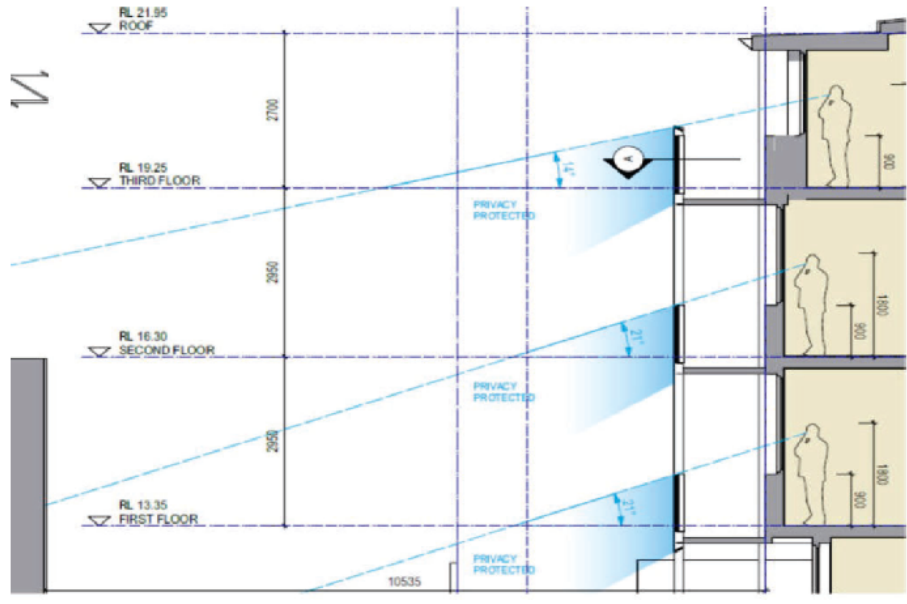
Windows on the southern side elevation are either elevated above floor level or are treated with a translucent film or as shown on the section diagram the use of (offset) privacy screens along the edge of the northern elevation demonstrate that overlooking is restricted from internal living areas toward No.12 and No.14 Goodwin Street for the upper level units.
